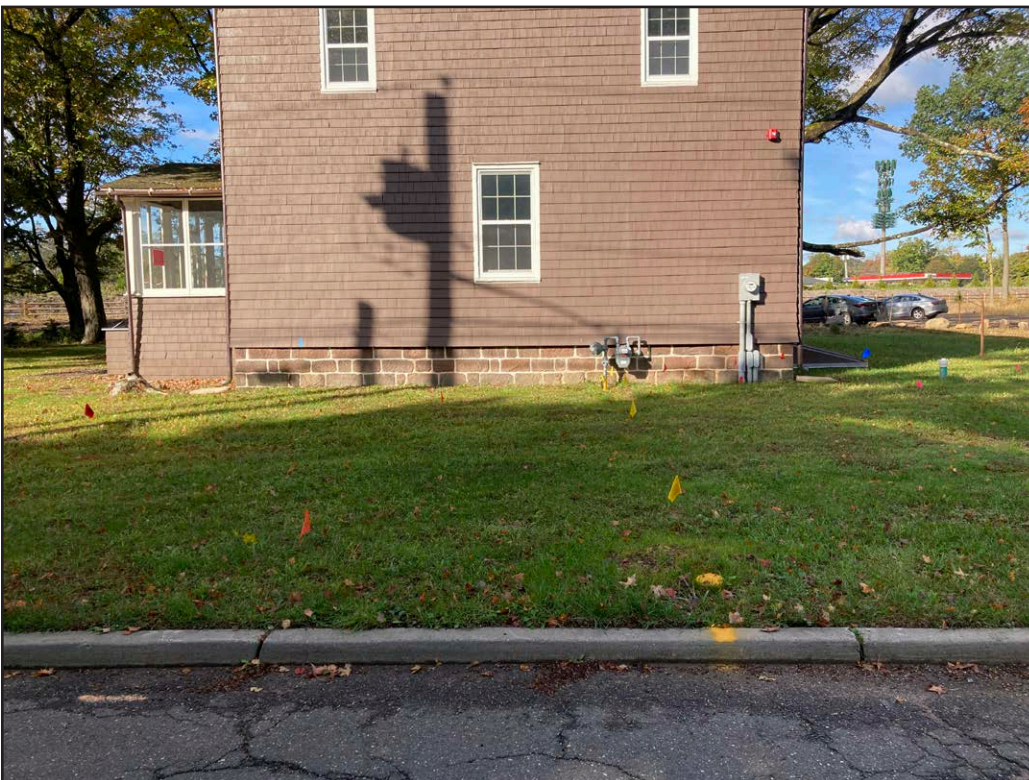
View of the John A. L. Zabriskie House showing the north elevation and the location of subsurface utilities (marked).
